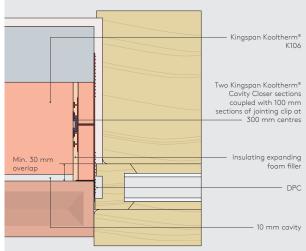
Jamb detail incorporating two Kingspan Kooltherm® Cavity Closer sections coupled 'back-to-back' with a jointing clip
